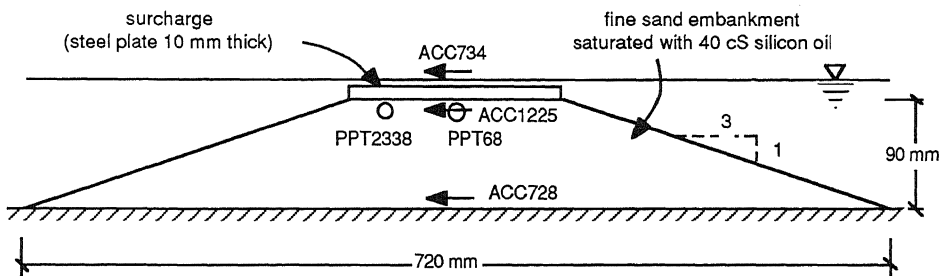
A model of a saturated soil embankment on a horizontal foundation (after Ref. 1)
